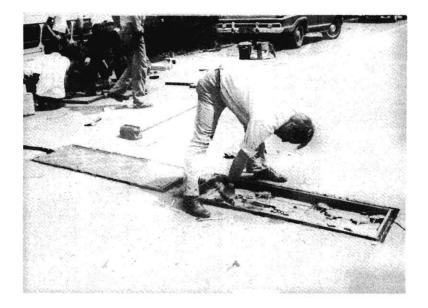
TECHNICIAN ADJUSTING LOAD TRANSDUCER POSITION
